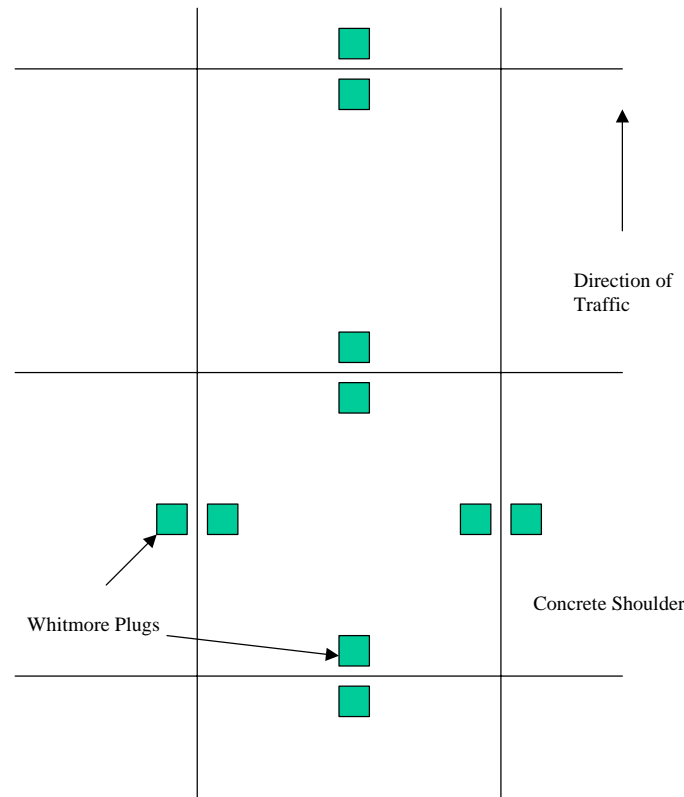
Typical Whitmore Plug Positions for Each Test Section
